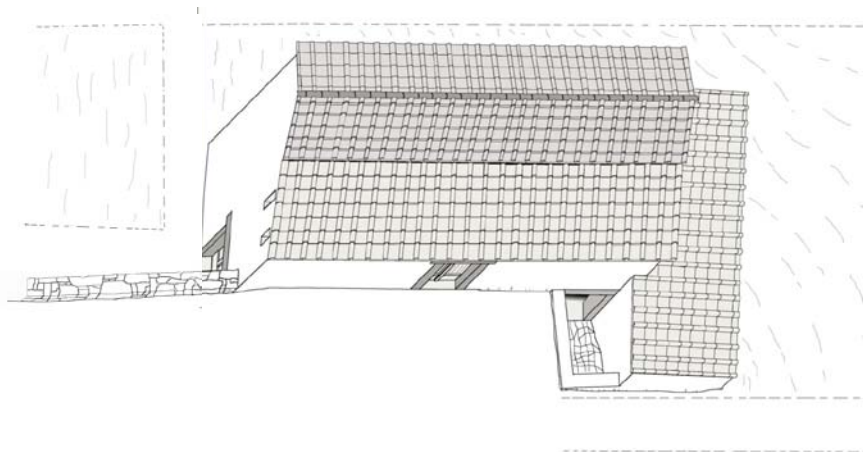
Isometric reconstruction of the Late Archaic House from north to south
